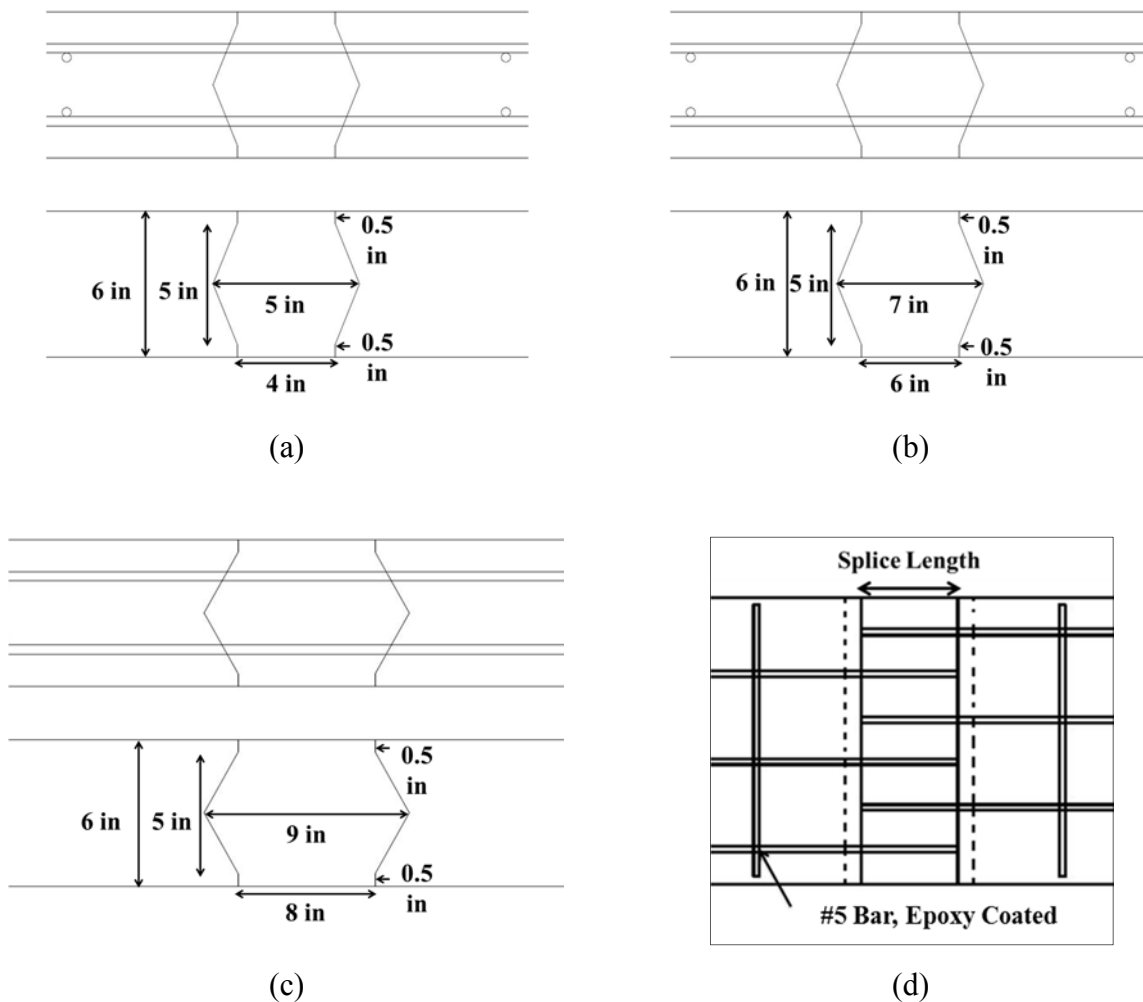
Joint Shape Details for the 4 in (a), 6 in (b) 8 in (c) joint, Lap Splice Connection Detail (d)
